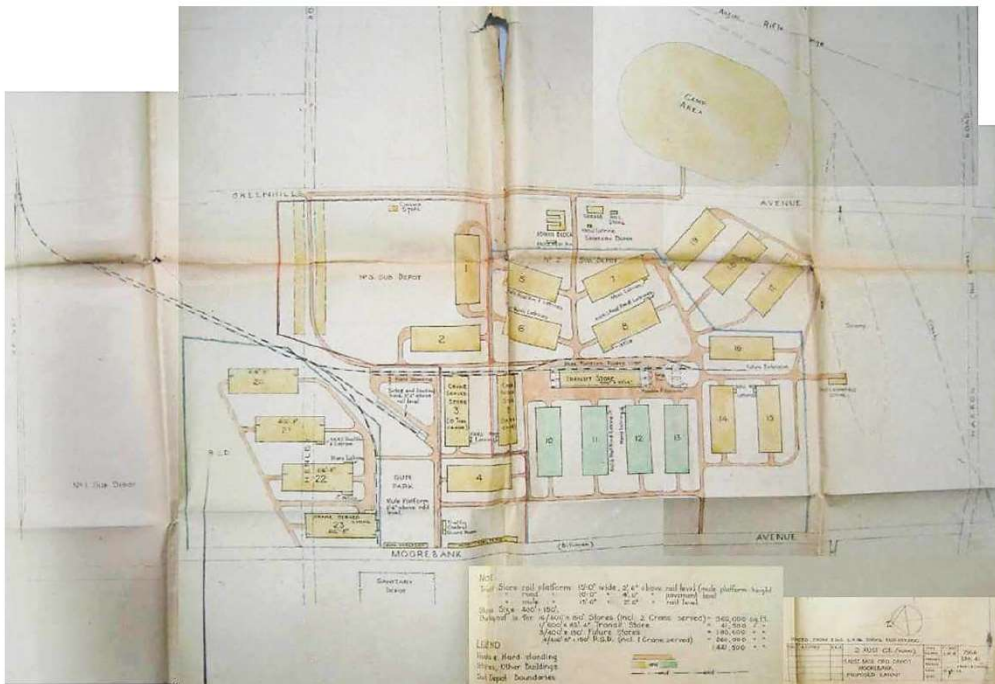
Plan of proposed layout of Moorebank Ordnance Depot 25/4/44 (NAA SP459/1, 420/7/1153) (Artefact 2012).
